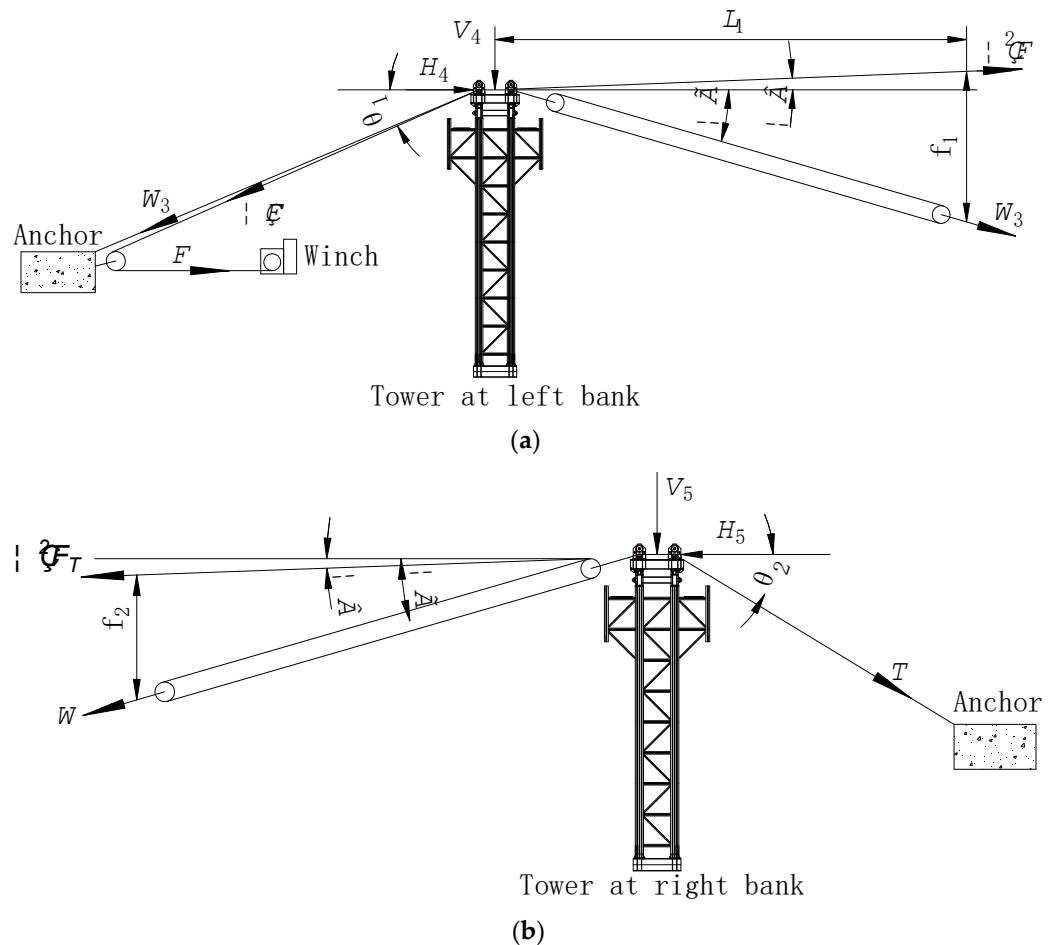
Schematic diagram of calculating the forces acting on a tower from a towing cable: (a) left bank; (b) right bank.
